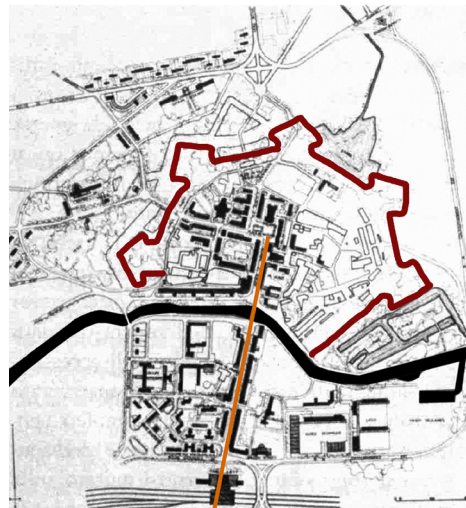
Proposed reconstruction plan of Maubeuge by Lucrat.
